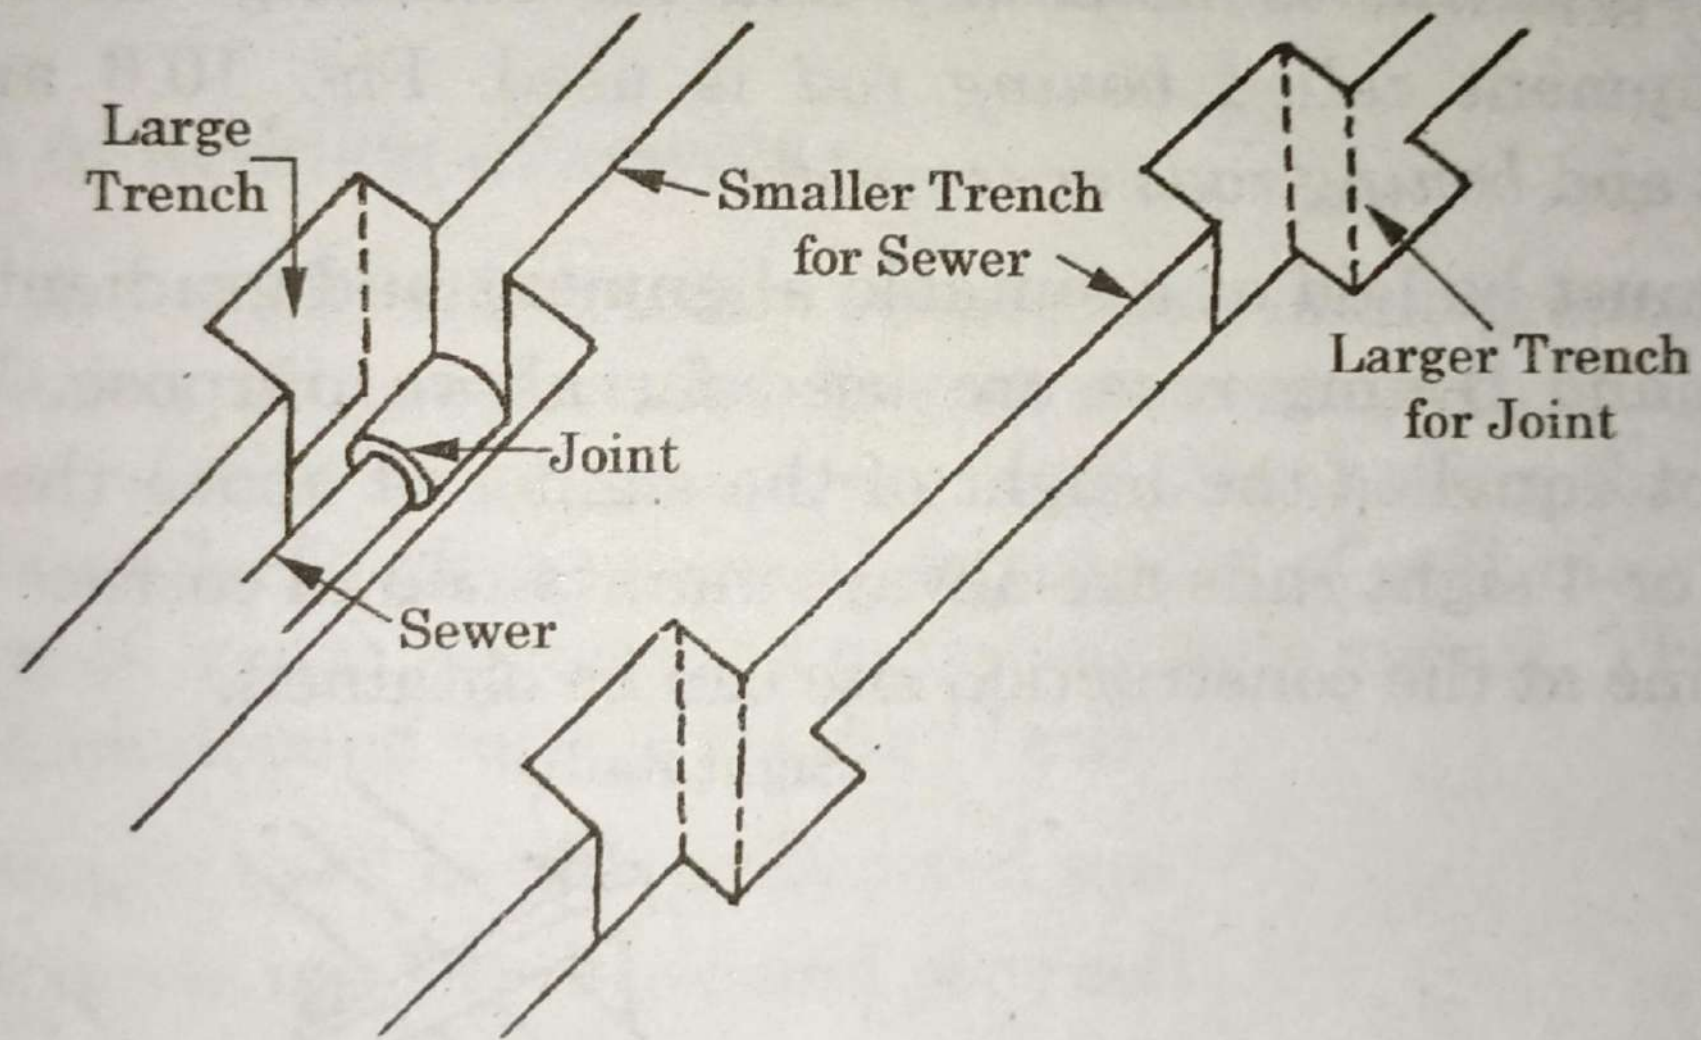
Excavation of Trenches For *Laying And Jointing* Sewers
